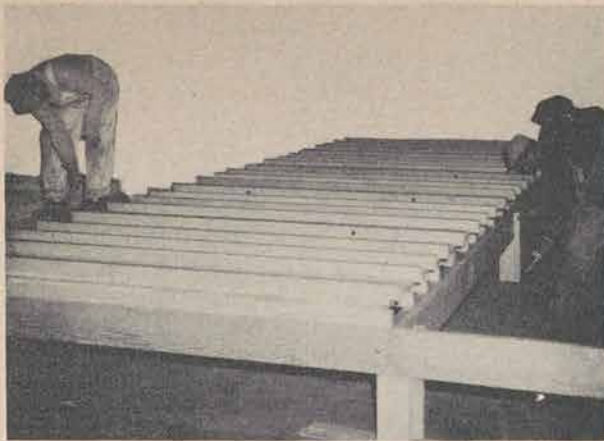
Bolting floor panels into one 8- by 20-foot section.
